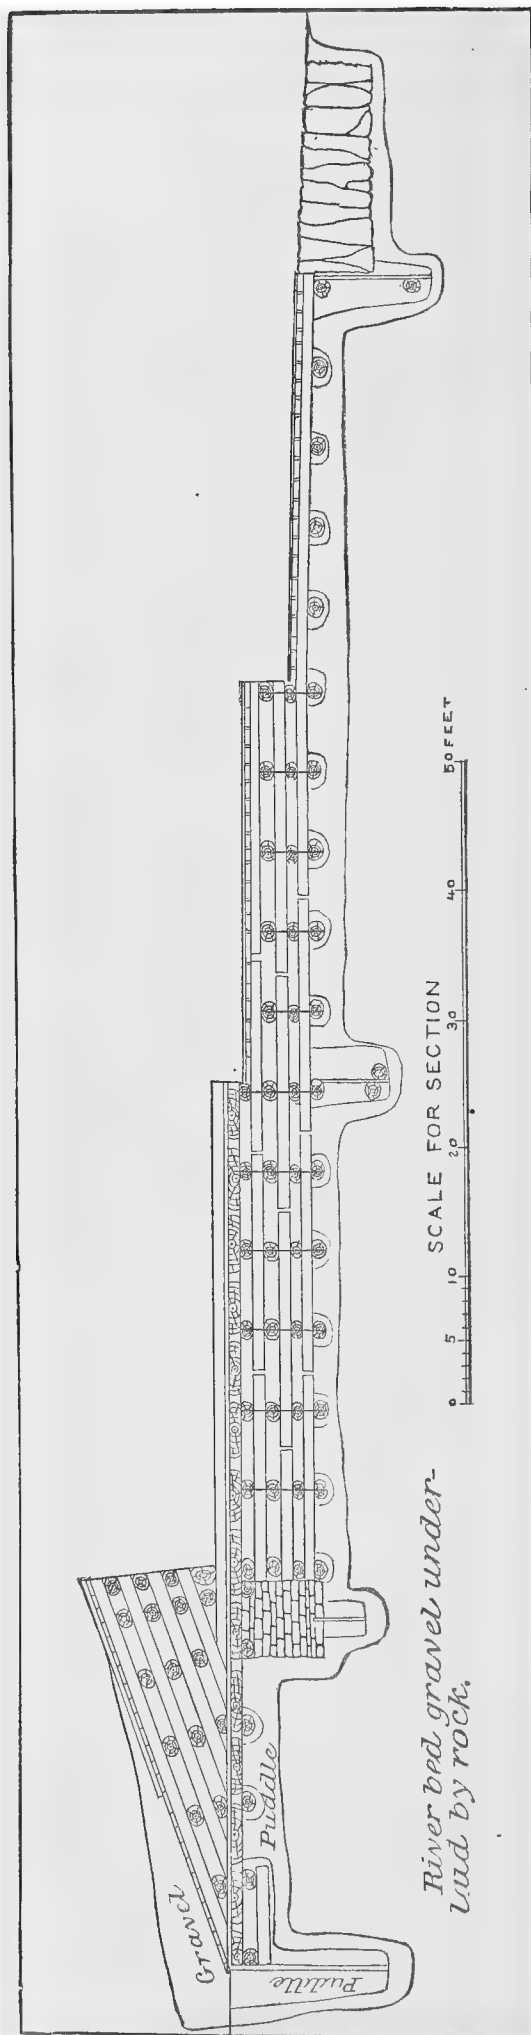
Cross-section of Hoosac Tunnel Dam.
